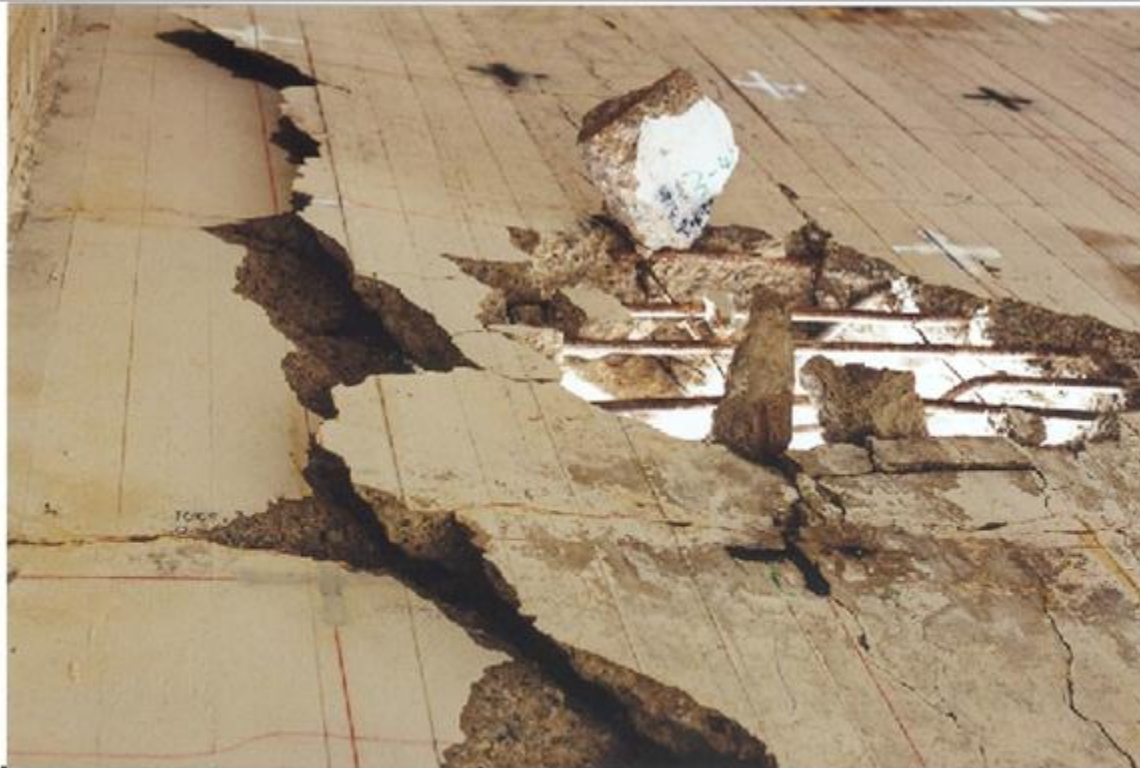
A typical punching shear failure of a bridge deck
